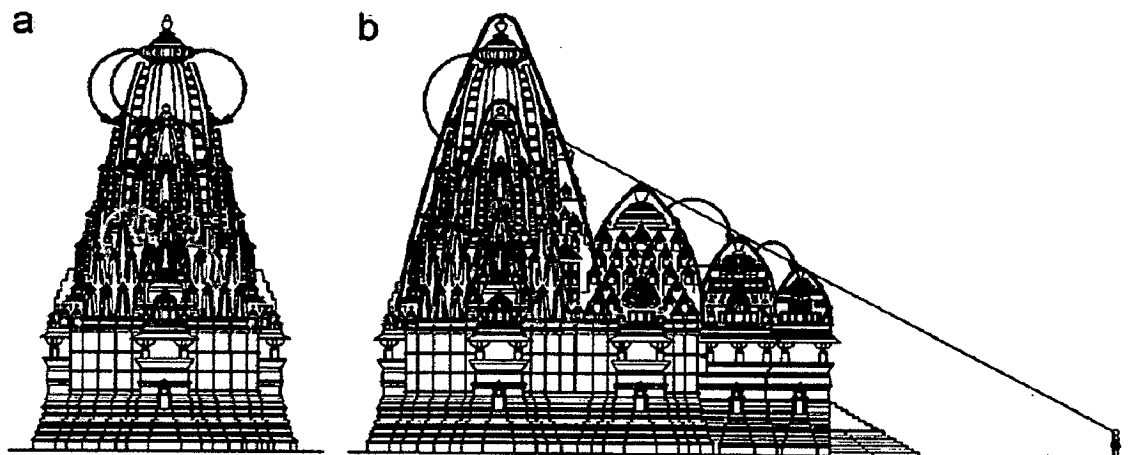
Elevations of Kandariya Mahadev temple, Khajuraho
